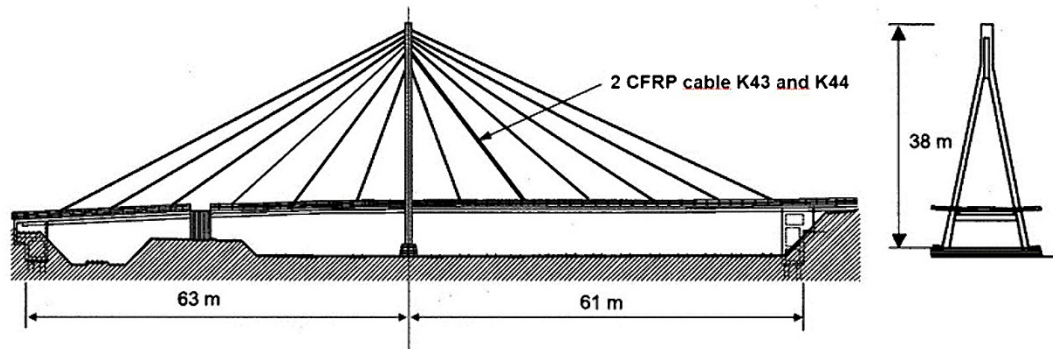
Layout of the cable-stayed bridge Storchenbruecke with the two CFRP-cables
